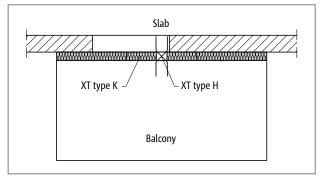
Schöck Isokorb[®] XT type K: Balcony freely cantilevered; optional with XT type H (from page 125) with planned horizontal loads (e. g. closed ballustrades)
